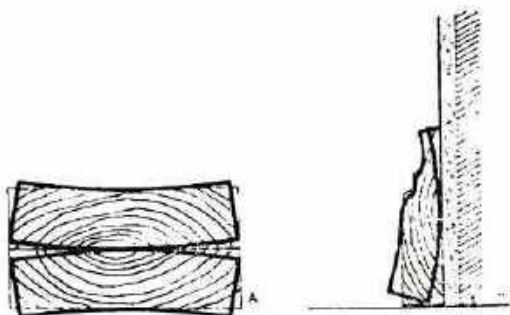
(A) THE LEFT SIDE OF THE BOARD BECOMES CONCAVE AND THE RIGHT SIDE BECOMES CONVEX. (B) A PRACTICAL EXAMPLE WHAT WILL HAPPEN IF A SKIRTING IS USED INCORRECT
